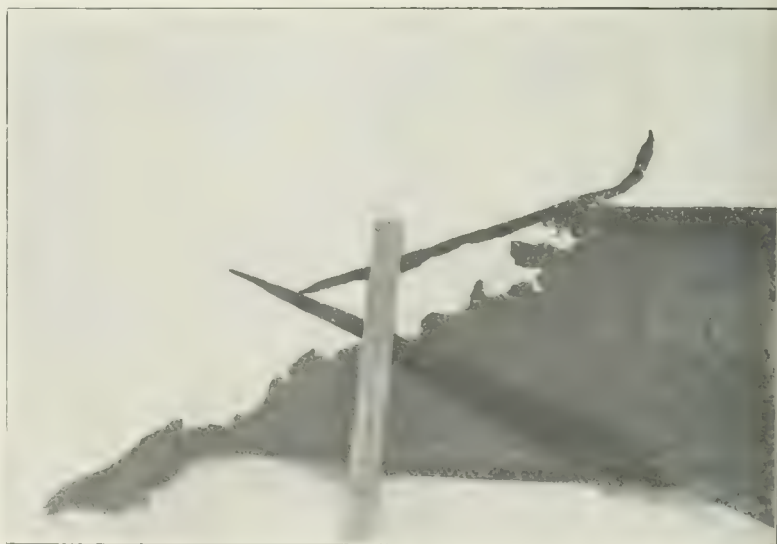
Cross-section of 8 In. Channel and Tie Rod.
